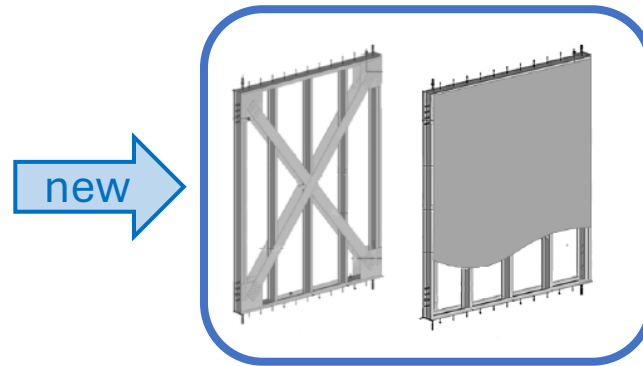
Lightweight steel systems: a) Strap braced walls; b) Shear walls with steel sheet or wood sheathing or gypsum sheathing
